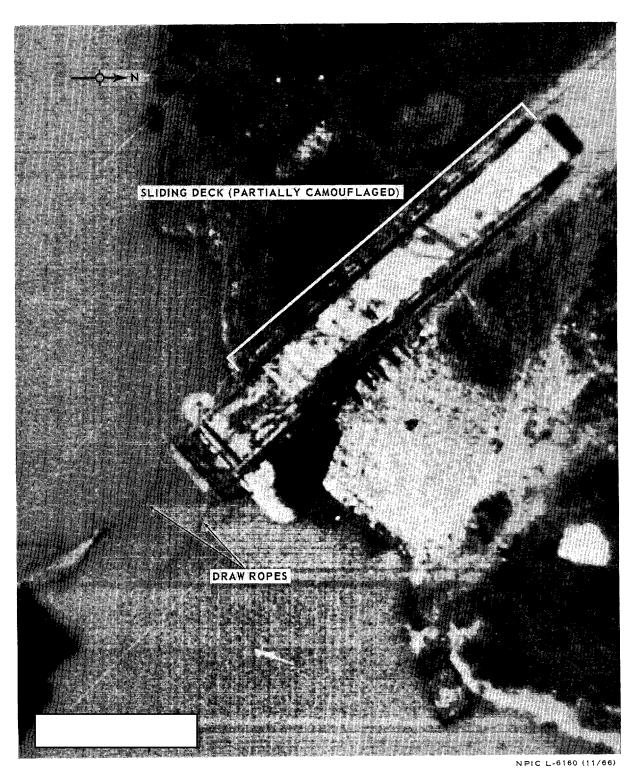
SLIDING DECK VEHICULAR BRIDGE, ROUTE 72, NORTH VIETNAM
